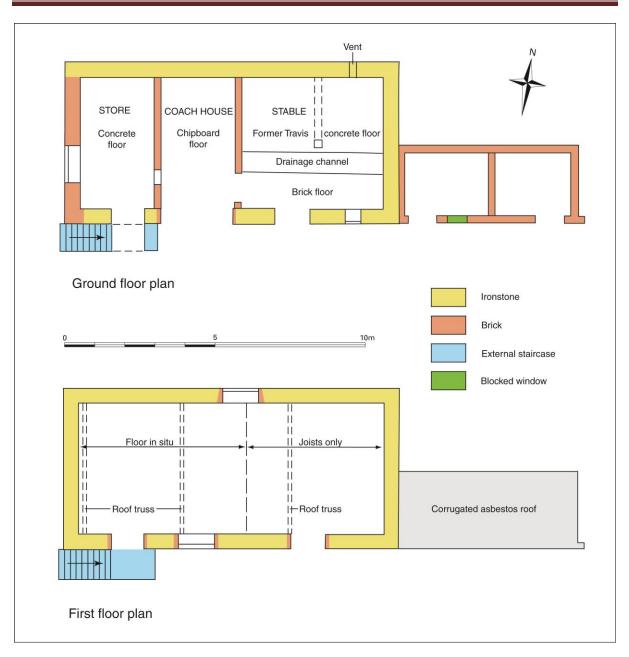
The ground and first floor plans of the buildings (Andy Isham after Lucinda Hudson Design).
